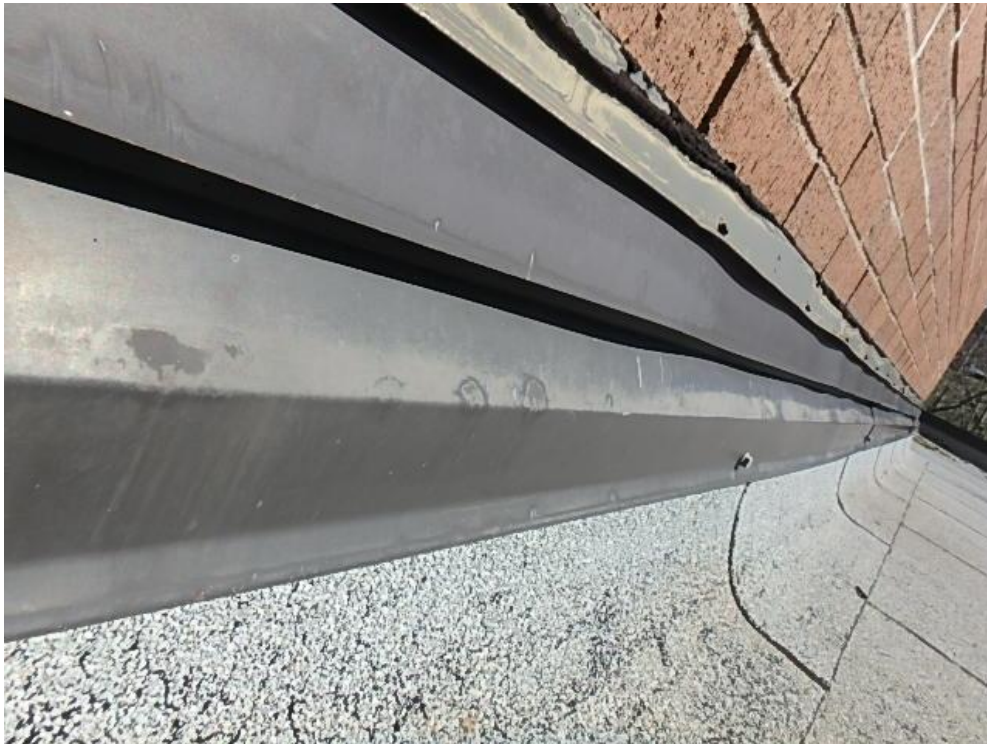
Roof Area 1.1 – Typical cracking on cap sheet membrane along parapet.
